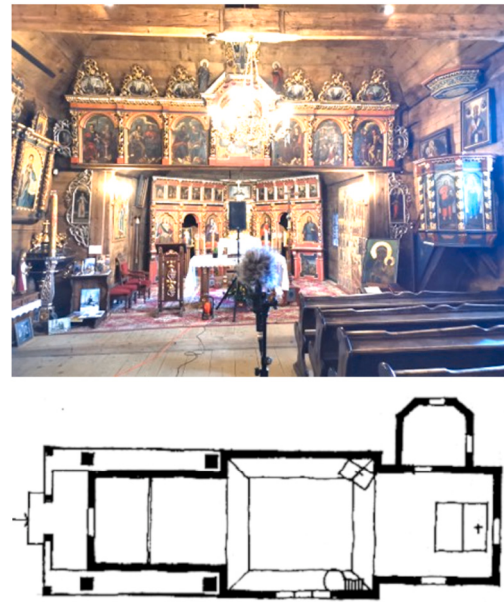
Interior photograph and floor plan of James the Apostle Church in Powroźnik.
